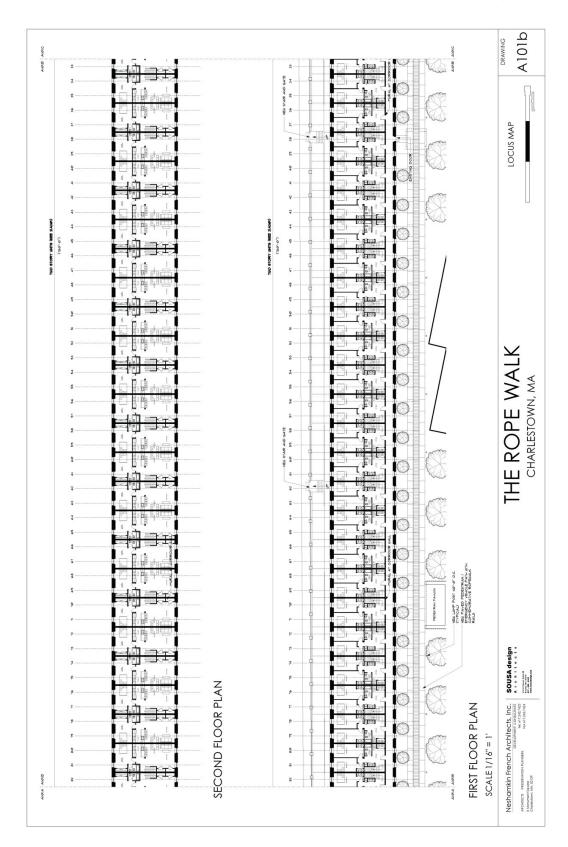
PNF Partial 1st/2nd Floor Plan - Ropewalk
